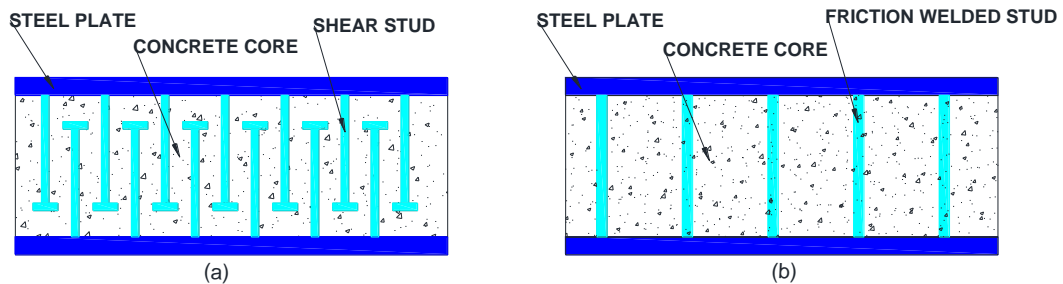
(a) Steel-concrete-steel composite construction (b) Bi-Steel
